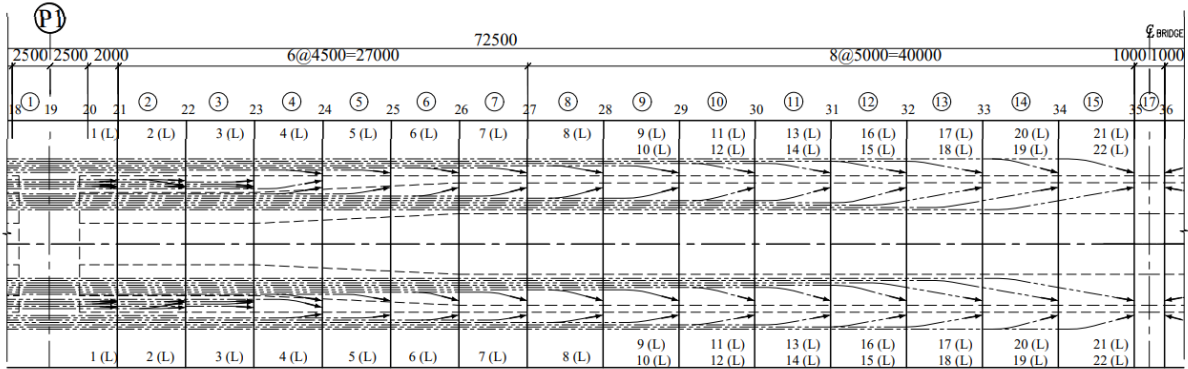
Cantilever Tendon Configuration of the Bridge Box Girder.
